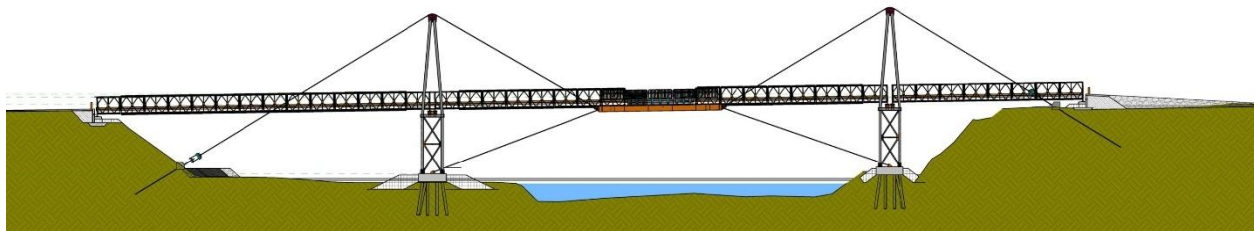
General arrangement elevation of the Tsolum River Bridge showing the three-span configuration, tower locations, and cable geometry.
